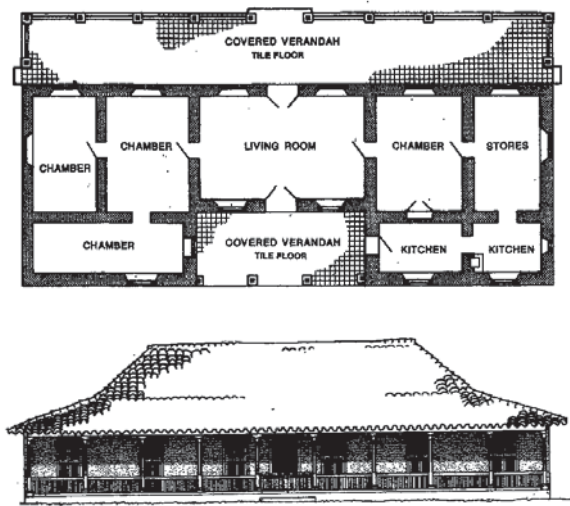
Plan and elevation of Leconte plantation house in Larue build ca. 1760
